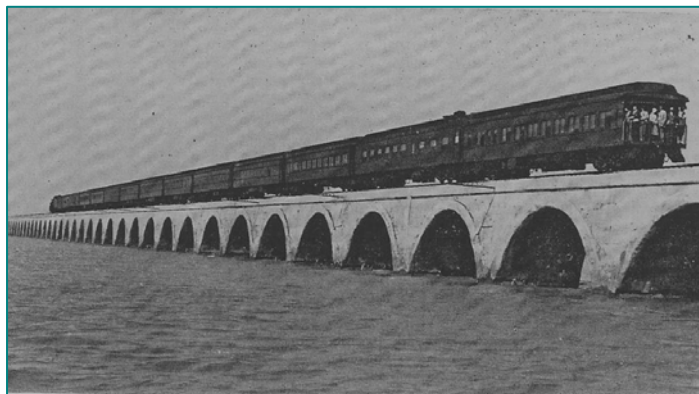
Long Key Viaduct Railroad Bridge and an FEC Passenger Train ca. 1915
